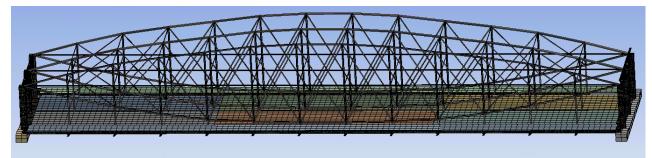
Finite element model of the Smithfield Street Bridge.
